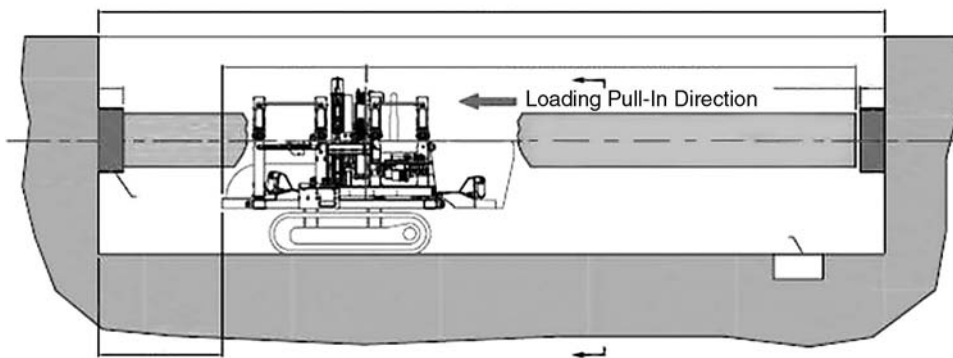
Sliplining installation of butt-fused PVC segmental approach.
